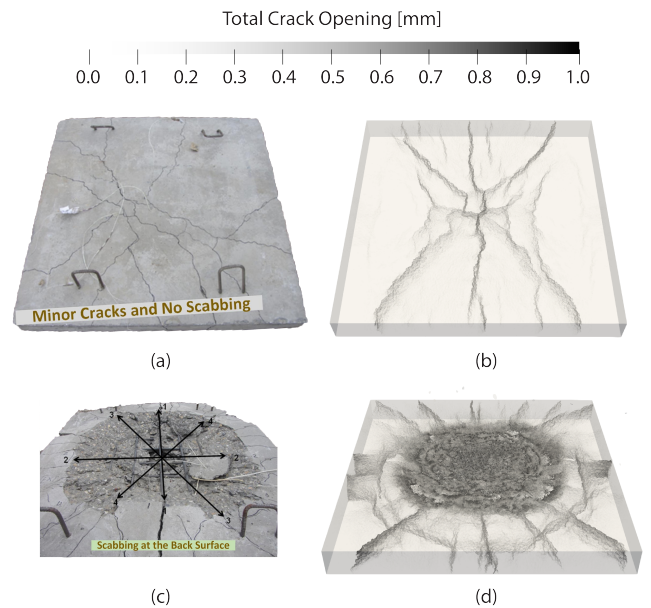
Slab underside of 500 mm standoff distance in (a) experimental study [49], (b) LDPM crack openings. Slab underside of 100 mm standoff distance in (c) experimental study [49], (d) LDPM crack openings. Note that all facets with opening greater than 1 mm (assumed fully disconnected) were removed for clarity.
